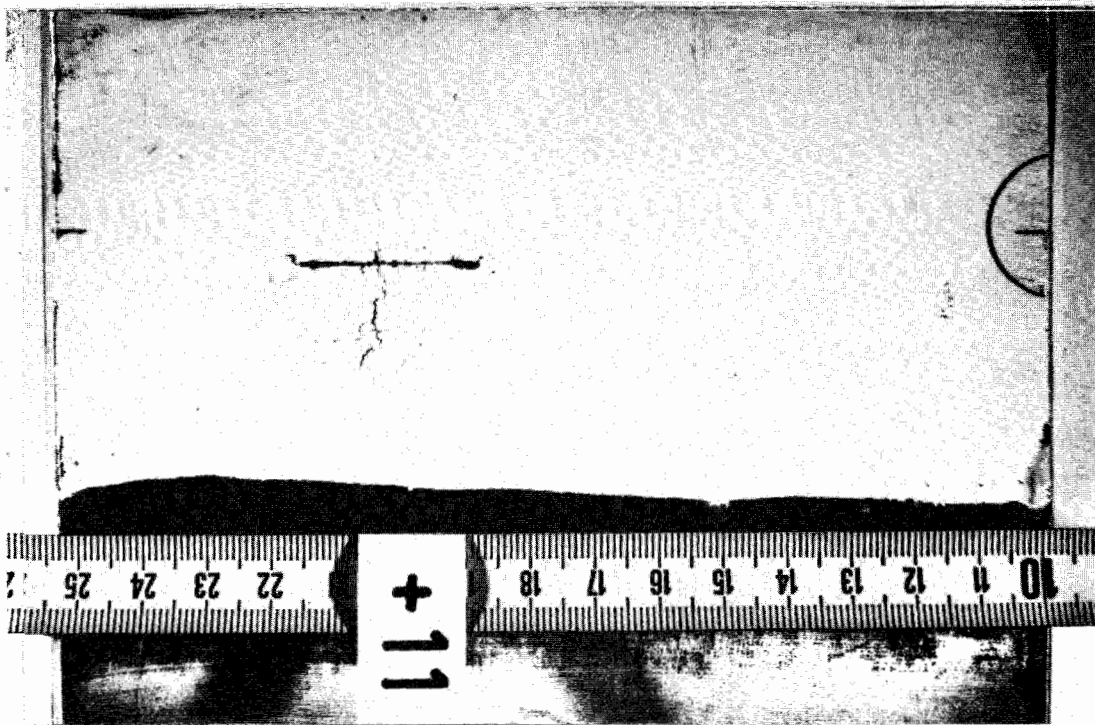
Specimen No. 11 : crack offset : + 6 mm
